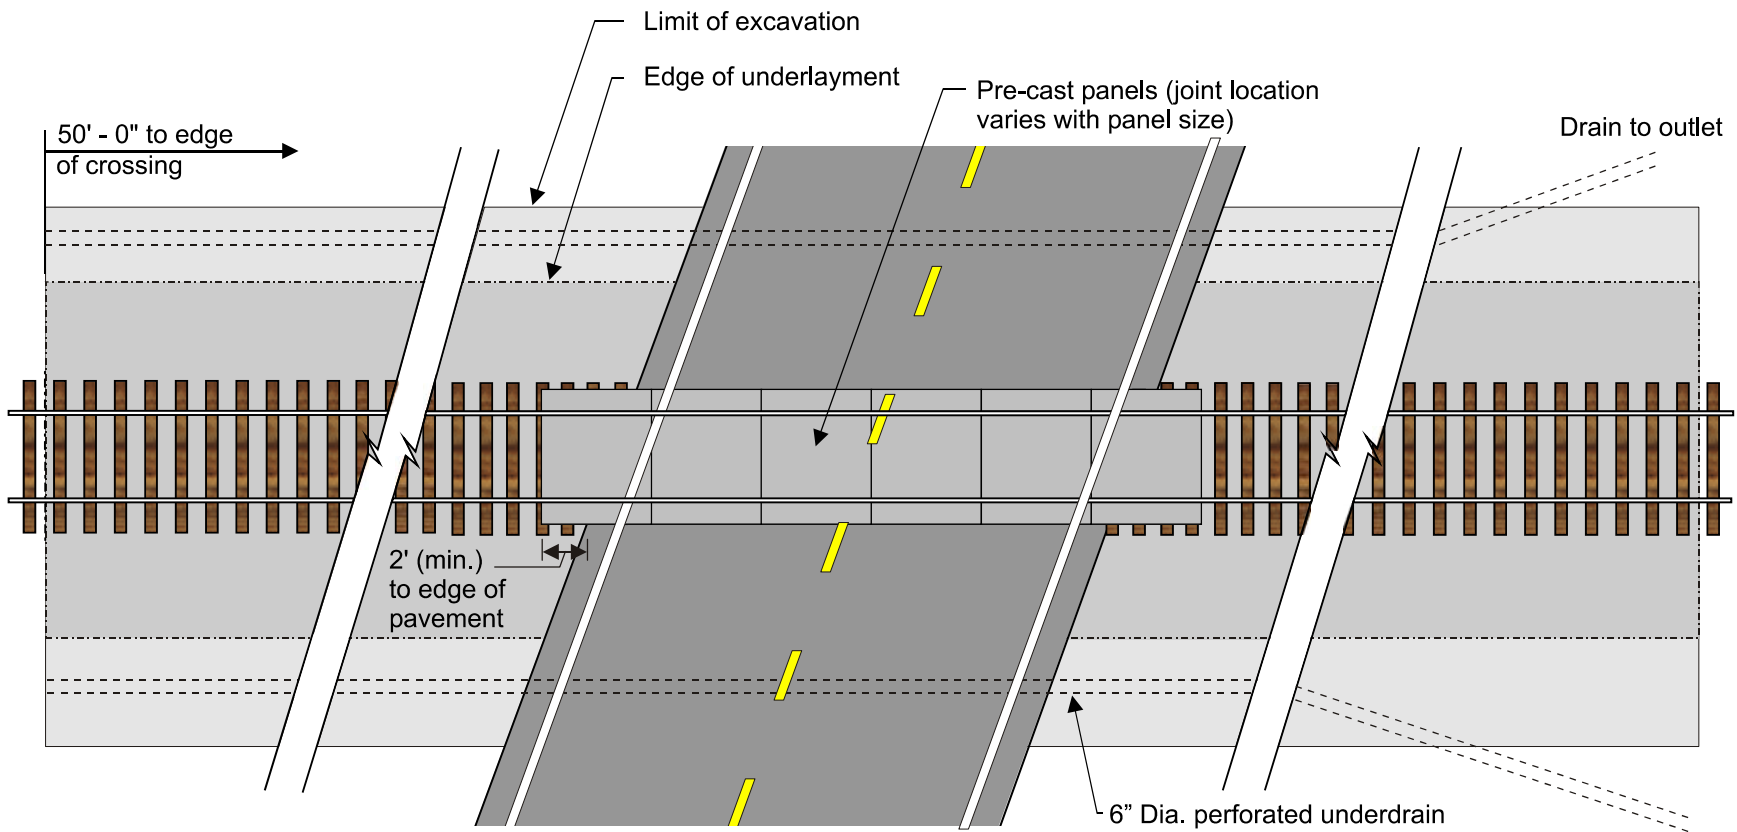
Profile View of Reconstructed Rail Crossing Using Precast Concrete Platform Panels.
